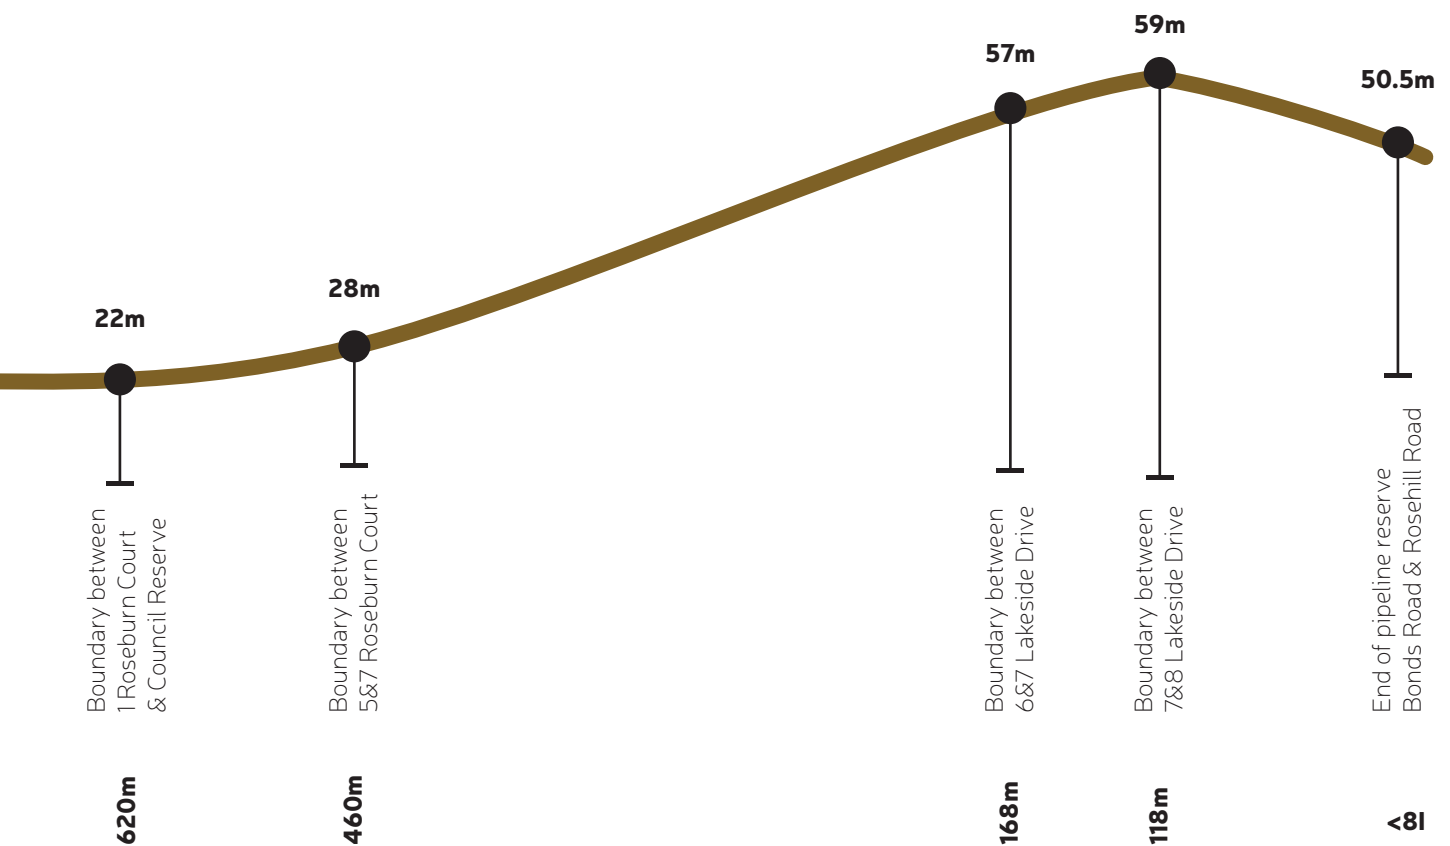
Long Sectional alignment and elevation chart for proposed Lower Plenty to Viewbank multi-purpose trail
